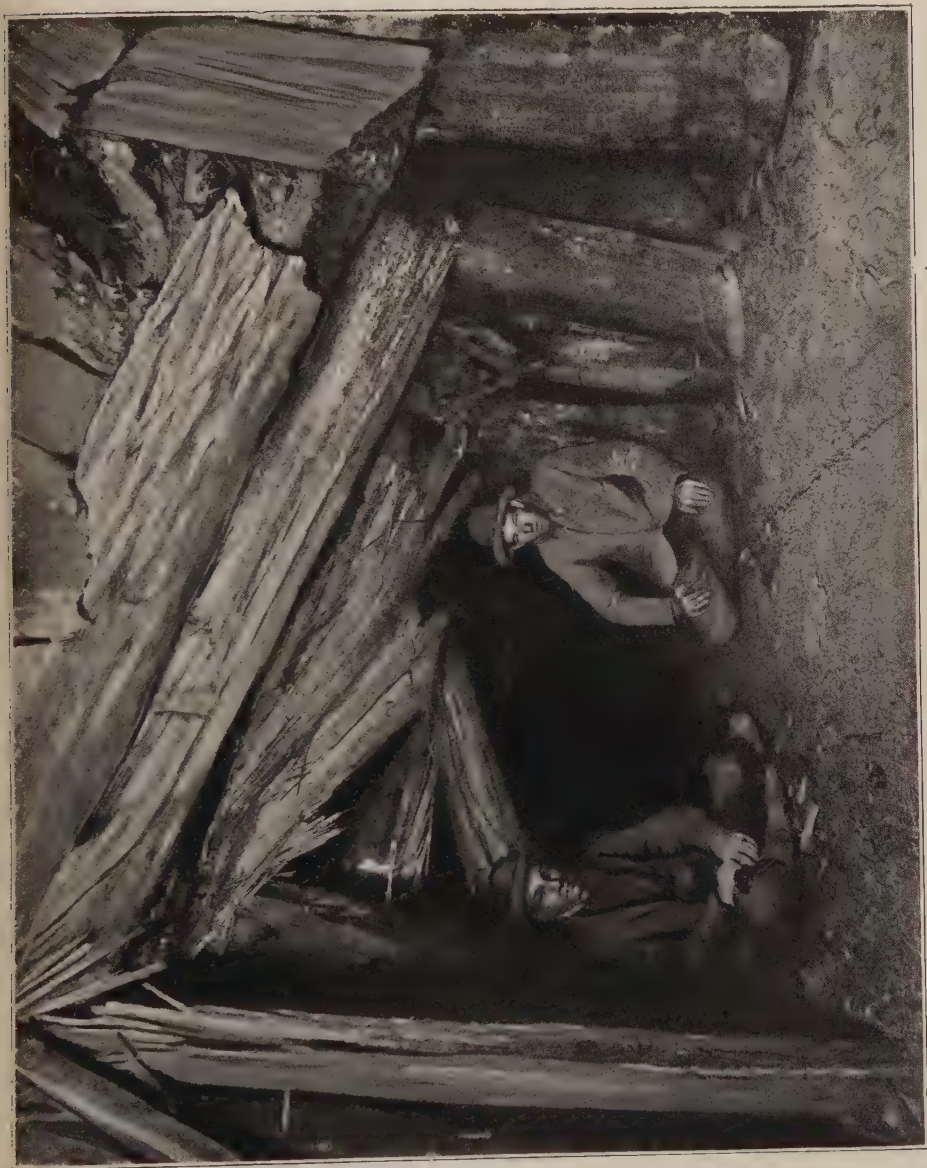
Drift Timbers Crushed by Heavy Caving Ground.
